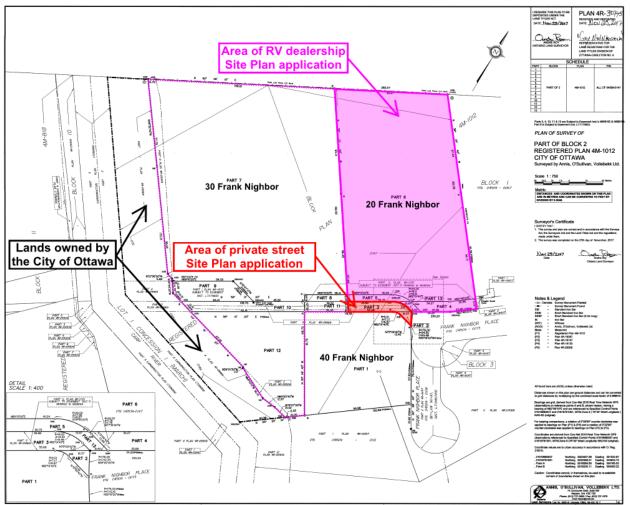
Plan 4R-30745, showing 20 Frank Nighbor Place (Fuchsia) and the extent of the private street Site Plan application over 30 Frank Nighbor Place.
